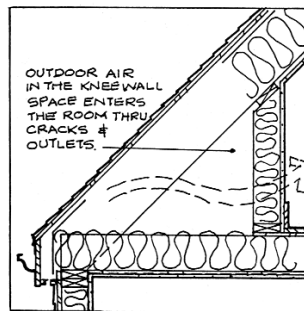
Avoid insulating kneewalls this way. Whenever possible, run the insulation between the rafters instead, because experience shows that insulated cathedral ceilings are much more airtight than insulated attic floors and kneewalls.
